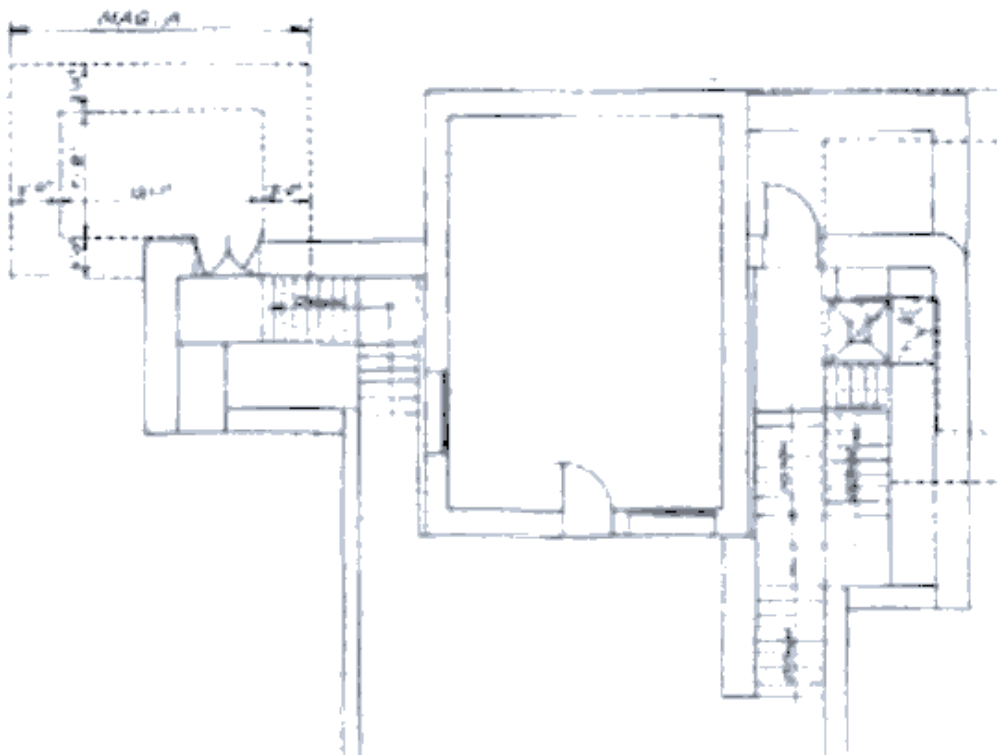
Plan, Crew Shelter WP1196 showing ground floor, former shell store, left, and staircases to the former cartridge store, right (DND, 1964).
